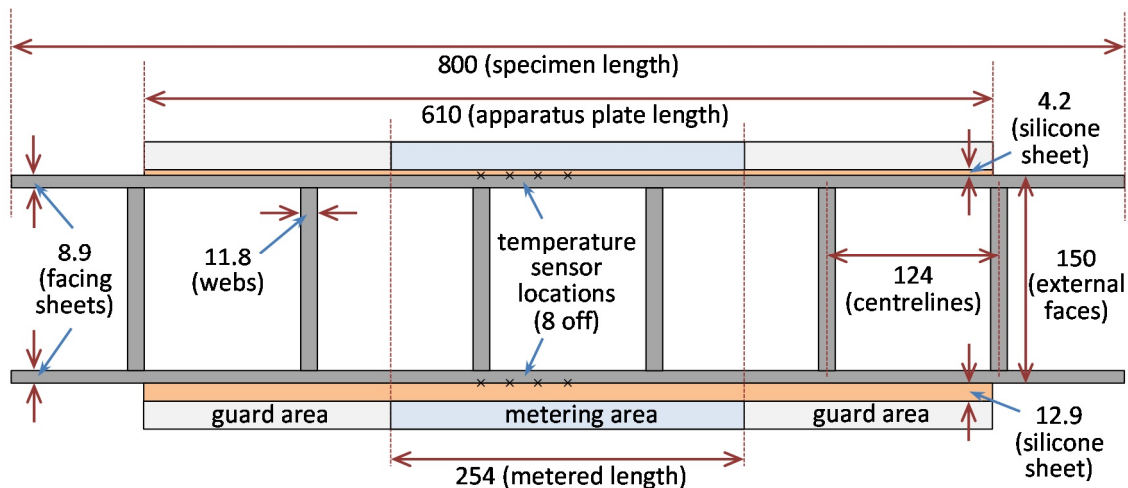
Webbed panel shown as set up for measurement in a 610 mm square test apparatus, with silicone sponge buffer sheets top and bottom. All dimensions are in mm.
